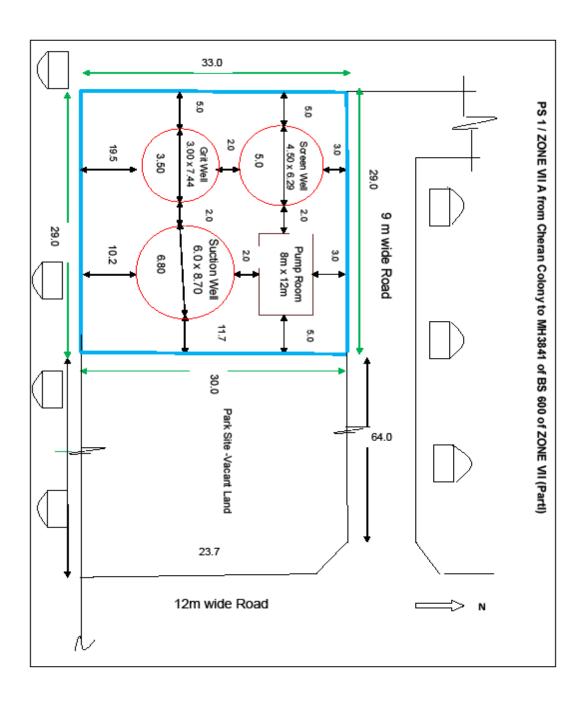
Site Set out Plans – Zone VII (Cheran Colony)
